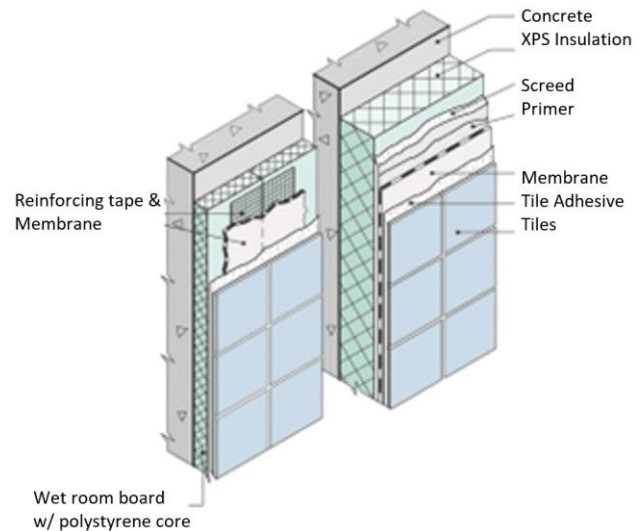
Example of Exterior Concrete Wall w/ some Interior Insulation. English Figure Version based on Fig. 55 [70]
